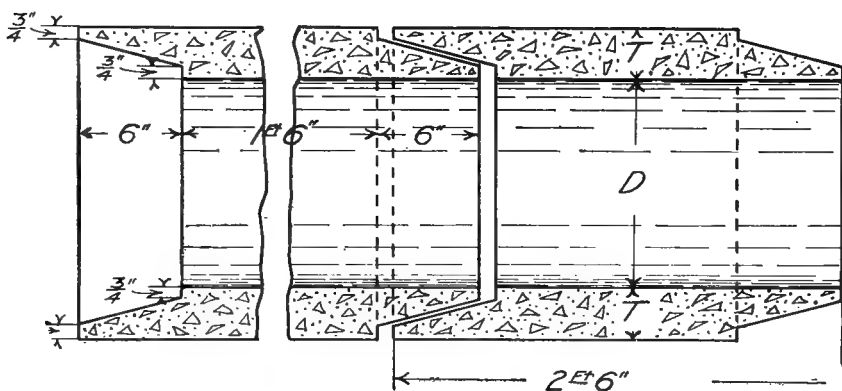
LONGITUDINAL SECTION OF SEWER PIPES.
